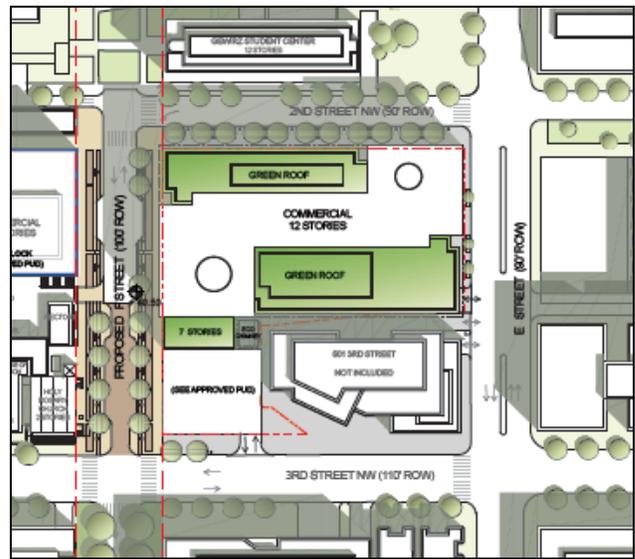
Proposed Plan for the South Block site, looking across 3<sup>rd</sup> Street NW.
